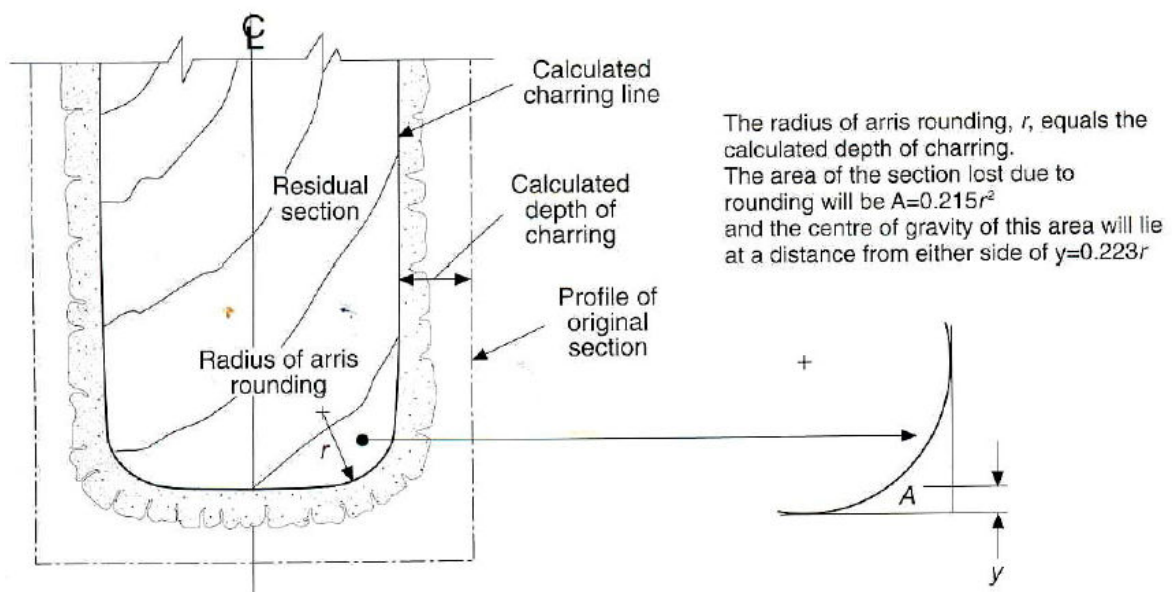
Residual cross section of timber beam exposed to fire (Buchanan, 2002)
